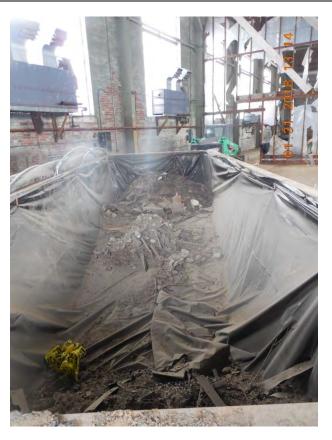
(2018): Debris was removed from Building 47-40 Round-House Interior floor and pit and 137
